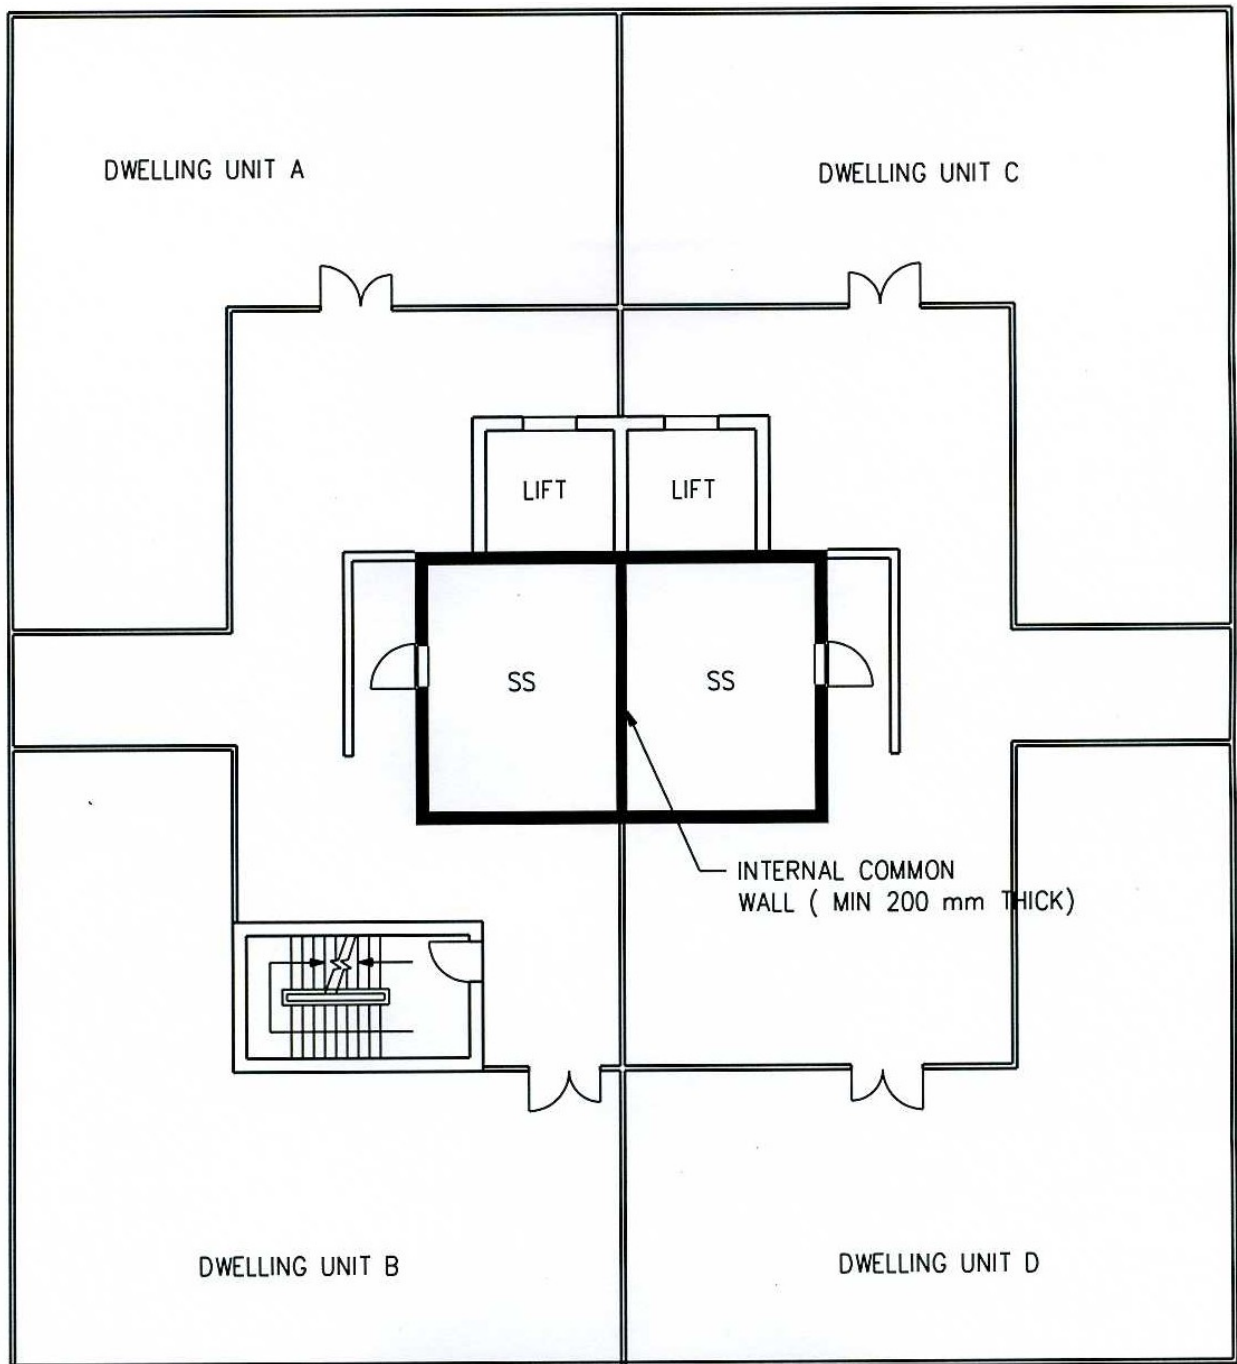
(a) INTERNAL COMMON WALL BETWEEN TWO SS IN NON-LANDED DWELLING UNITS
